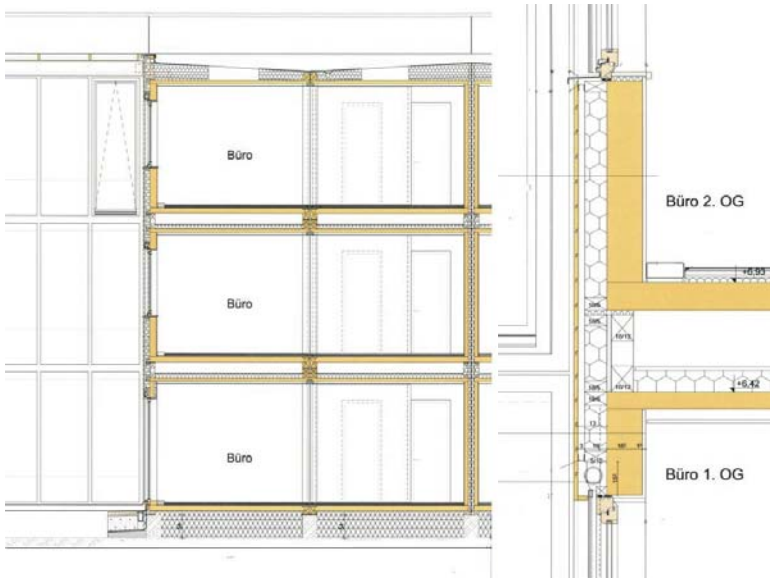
Vertical section of office block and a detail section of the structure.
